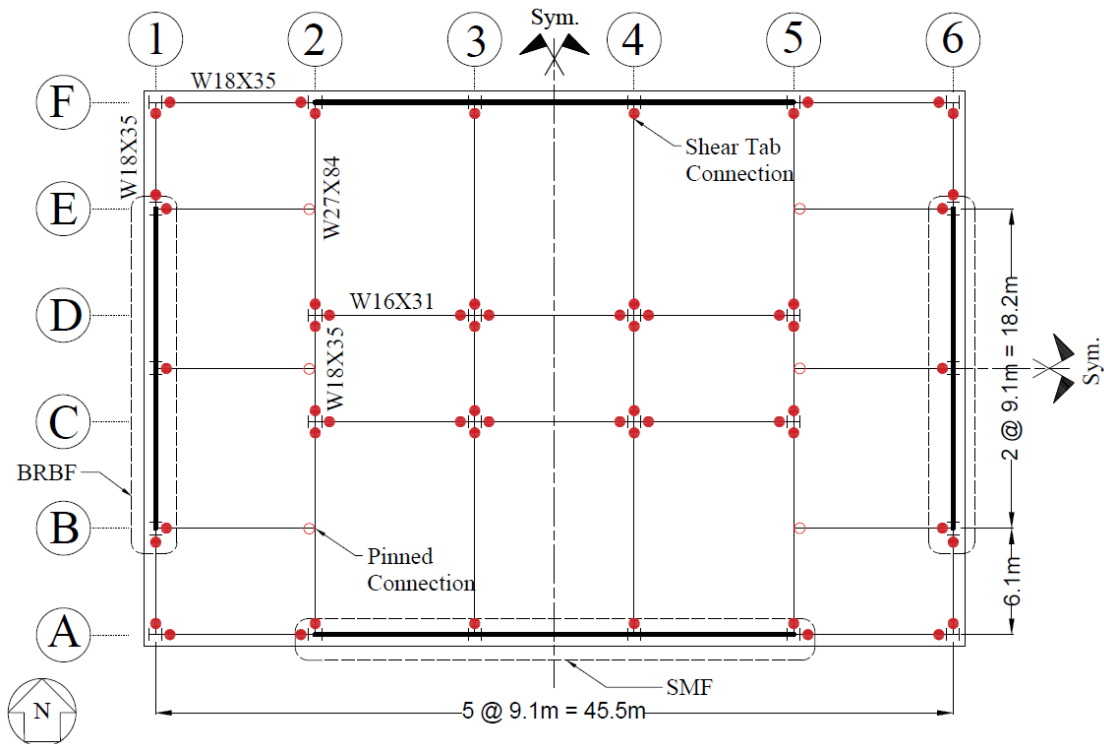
Typical Floor Framing Plan for 16-story Buildings
